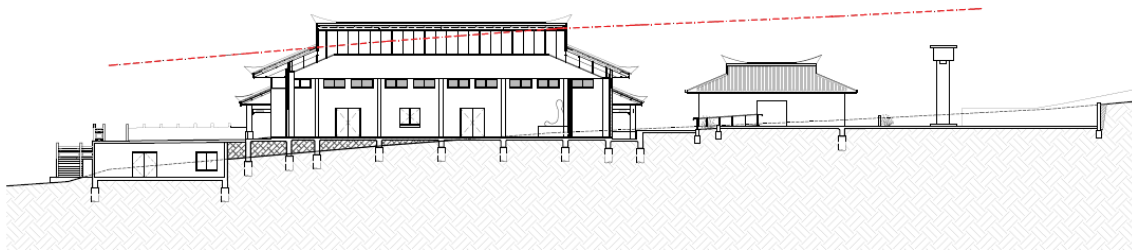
Proposed section of the building showing the 8.5metres maximum building height line
